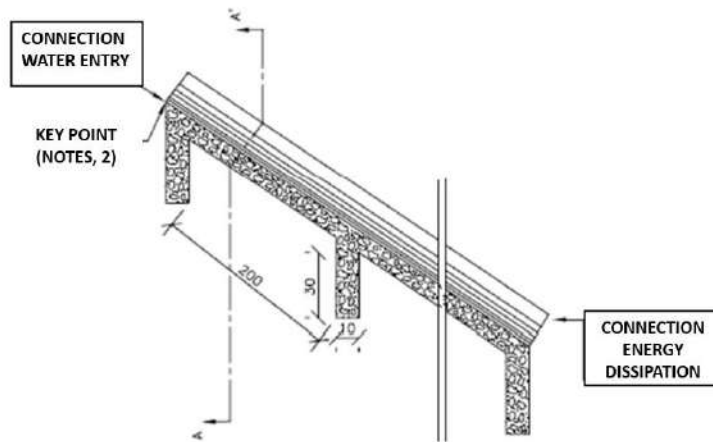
Illustration of rapid embankment water descents from fast landfills, type RED-01 (Source: QG Konstruktion GmbH).
